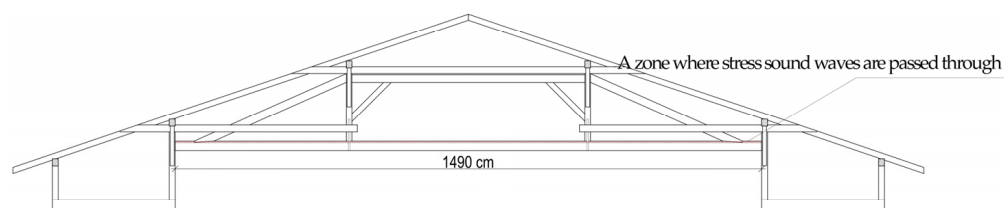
Roof girder, a segment of the roof structure through which the stress-sound wave was passed.
